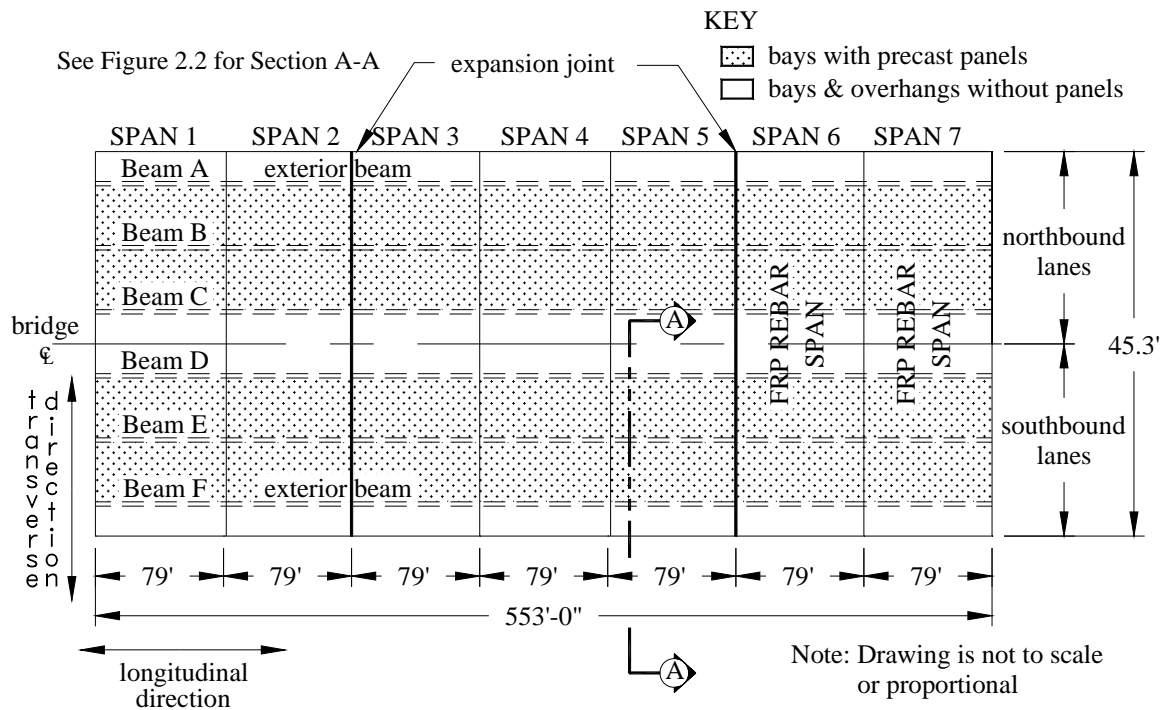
Plan View of the Sierrita de la Cruz Creek Bridge
